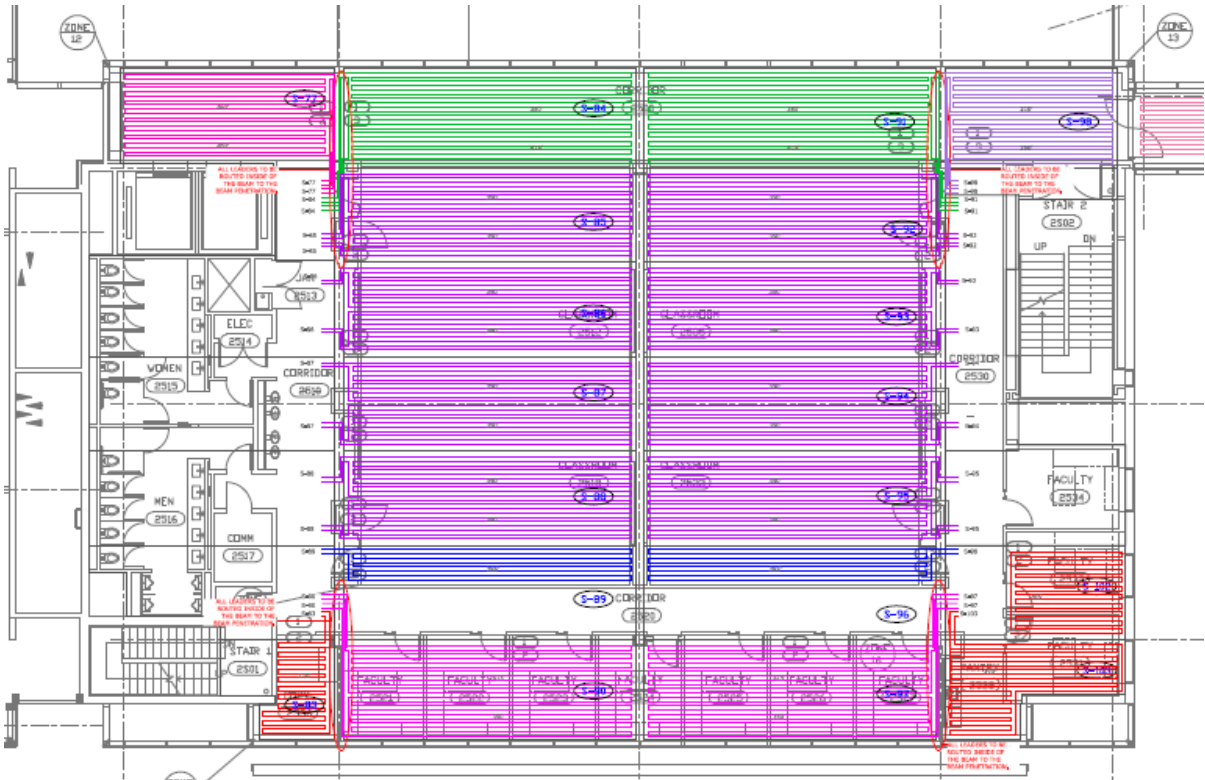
A sample radiant system layout utilizing precast floor slabs.
